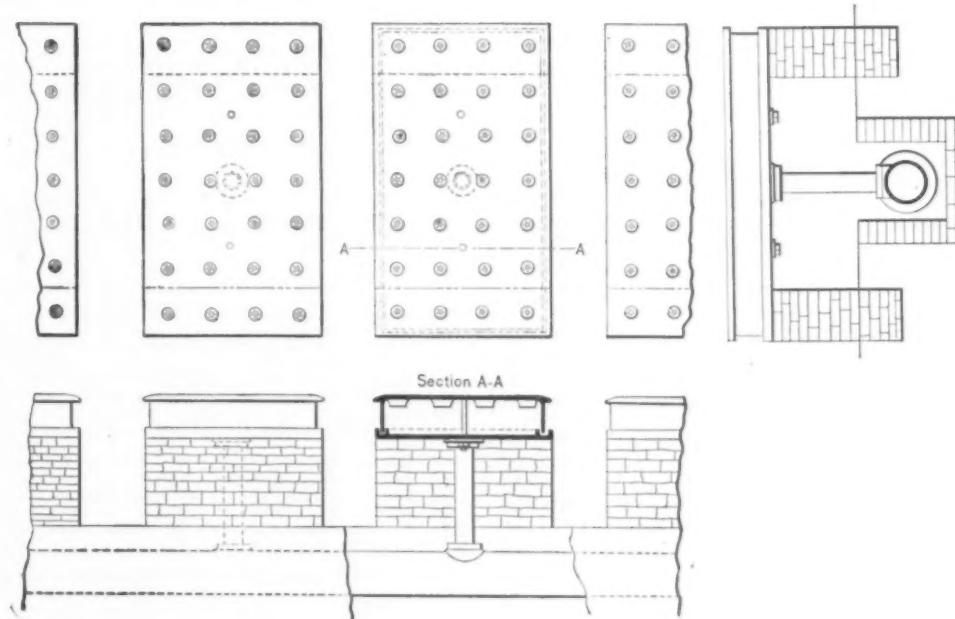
Plan and Elevations of Pneumatic Plate Conveyor.
